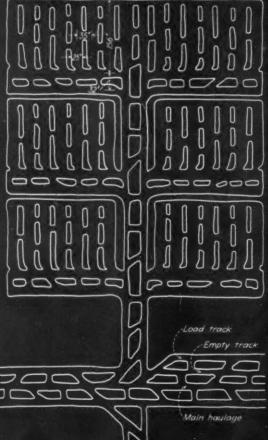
New standard room panel for New Orient mine. Plan also shows method of installing sidetracks for empties and loads.
